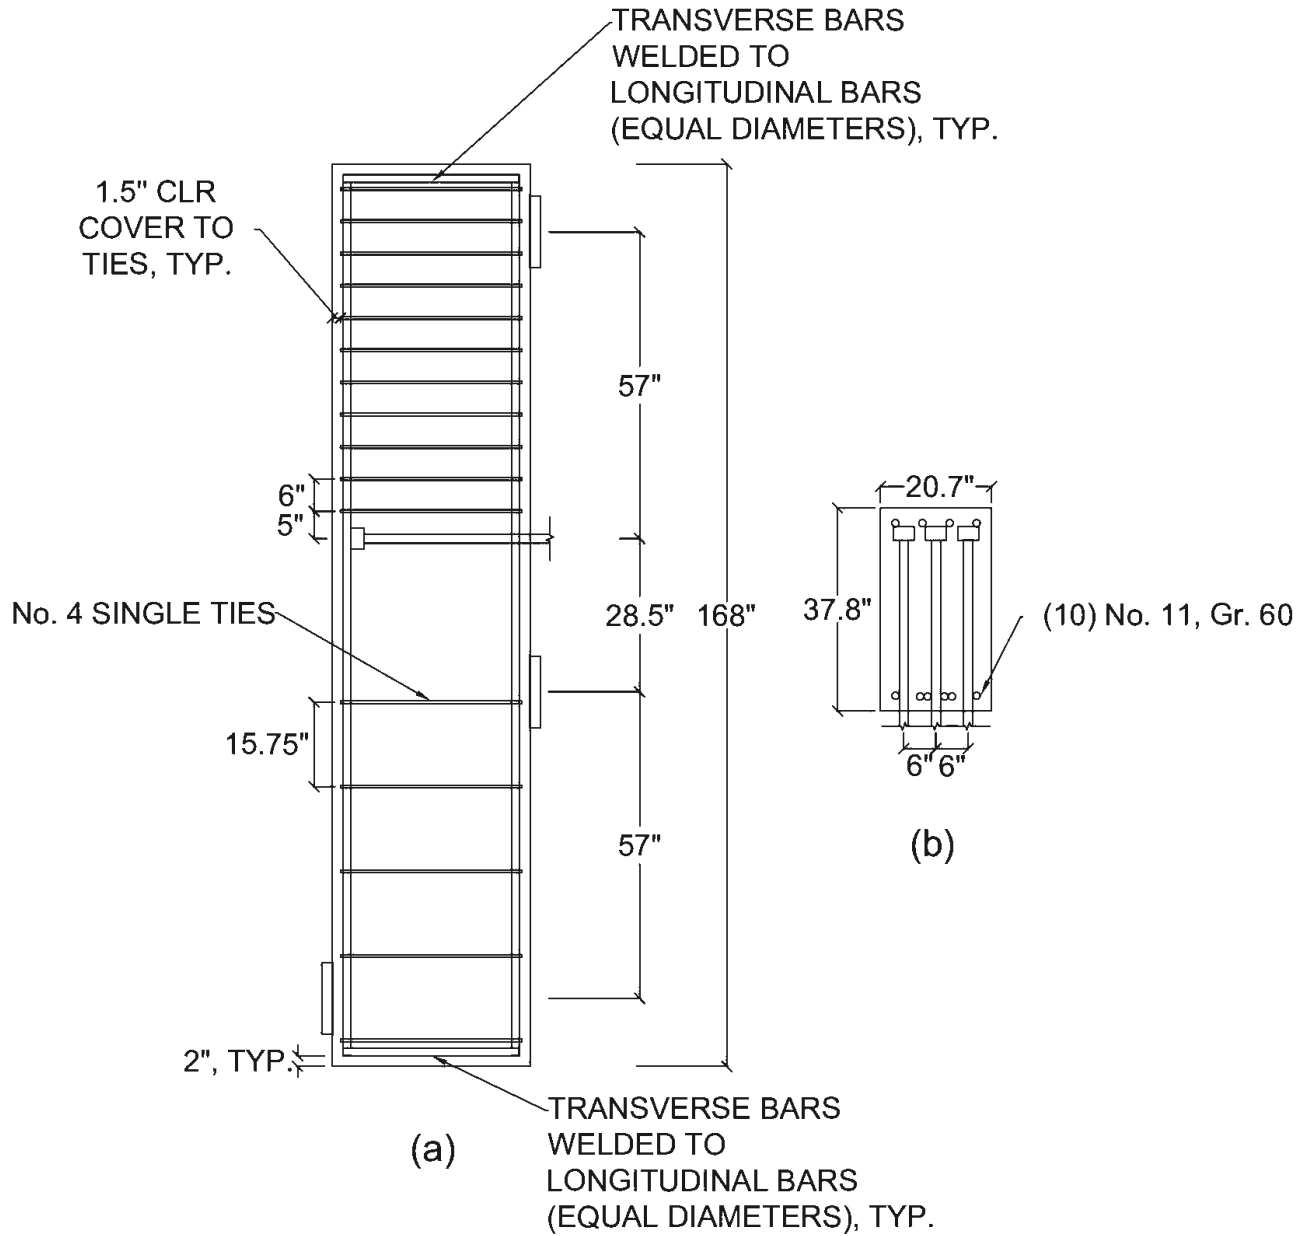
Details of reinforcement layout for No. 14 headed bar specimen 14-7: (a) elevation, (b) cross-section
